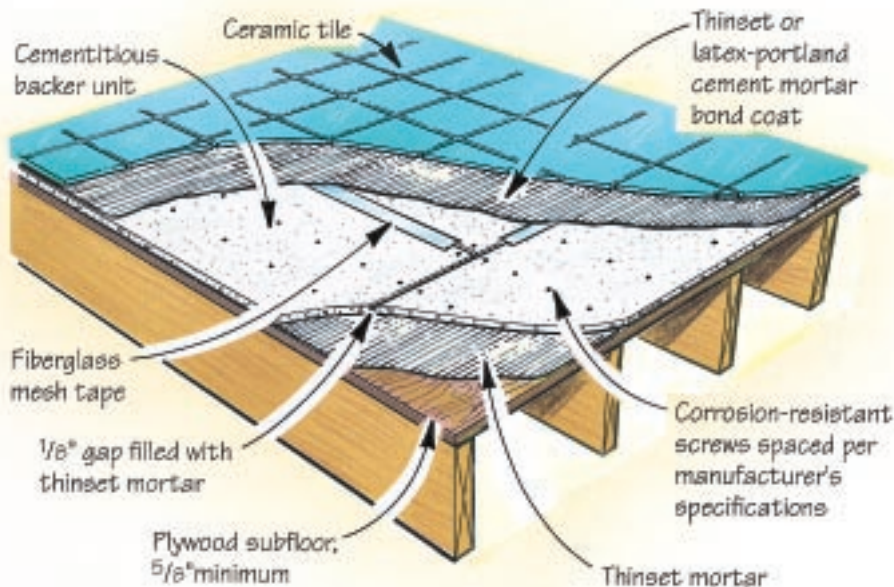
Floor framing for tile must be level to within $\frac{1}{8}$ inch in 10 feet. Space joists no more than 16 inches on-center, and make sure deflection is limited to $L/360$. Leave $\frac{1}{8}$ -inch gaps between plywood subfloor panels ($\frac{1}{4}$ inch at walls). Install the backerboard over a thin setting bed of thinset mortar, making sure that none of the CBU edges align with the plywood joints.
